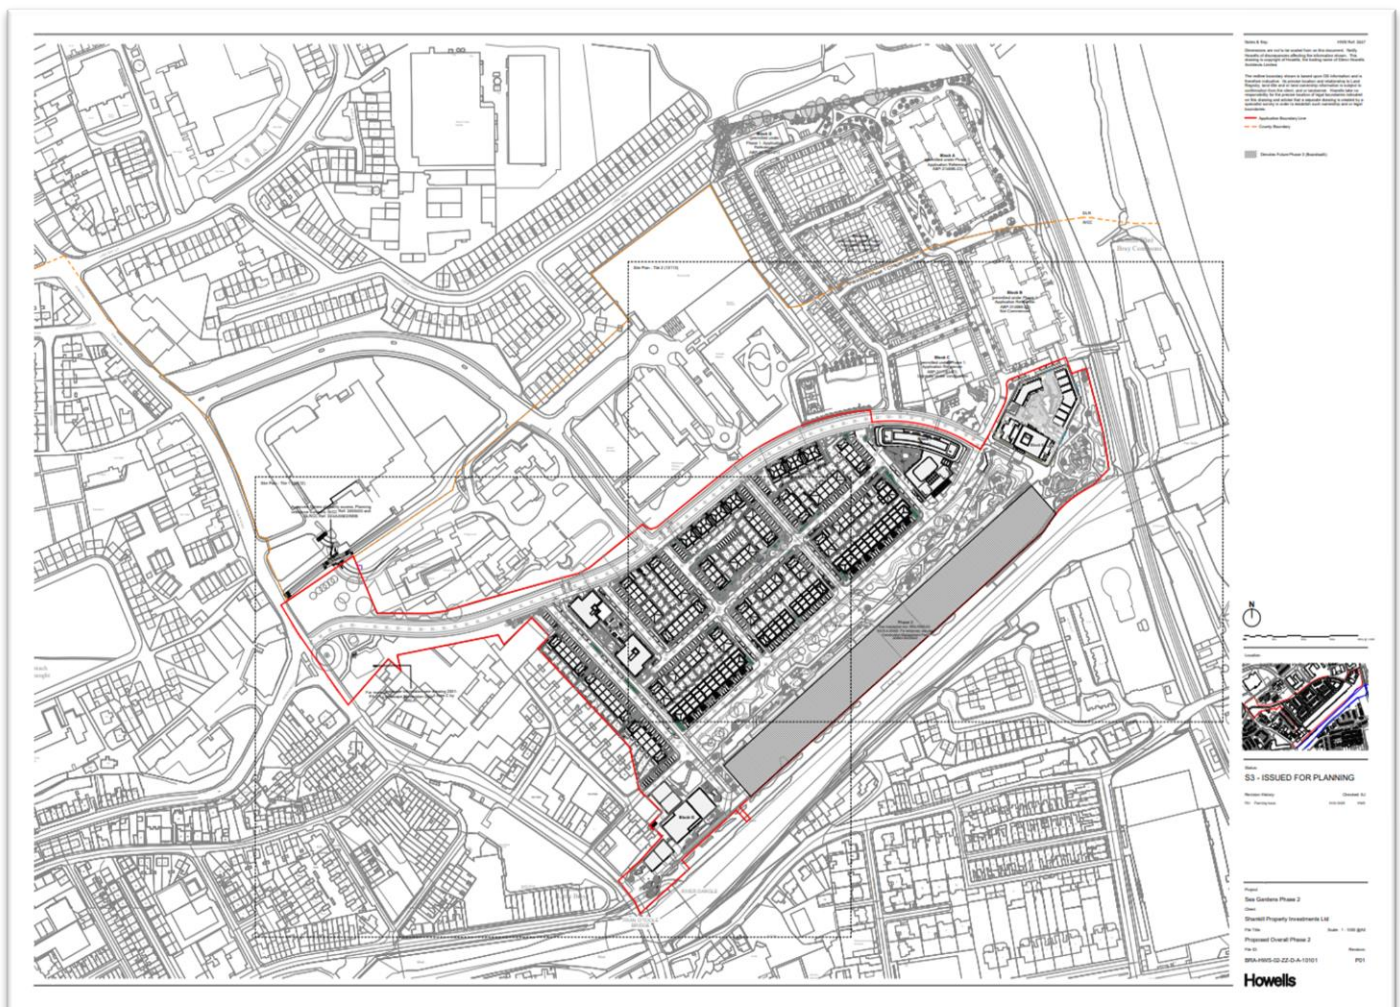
Proposed Sea Gardens Phase 2 Site Layout
